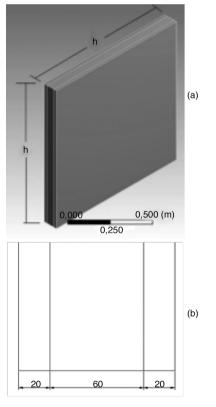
Isometric projection of the building wall (a) with h = 1 m and the cross section (b) with lengths in mm.
